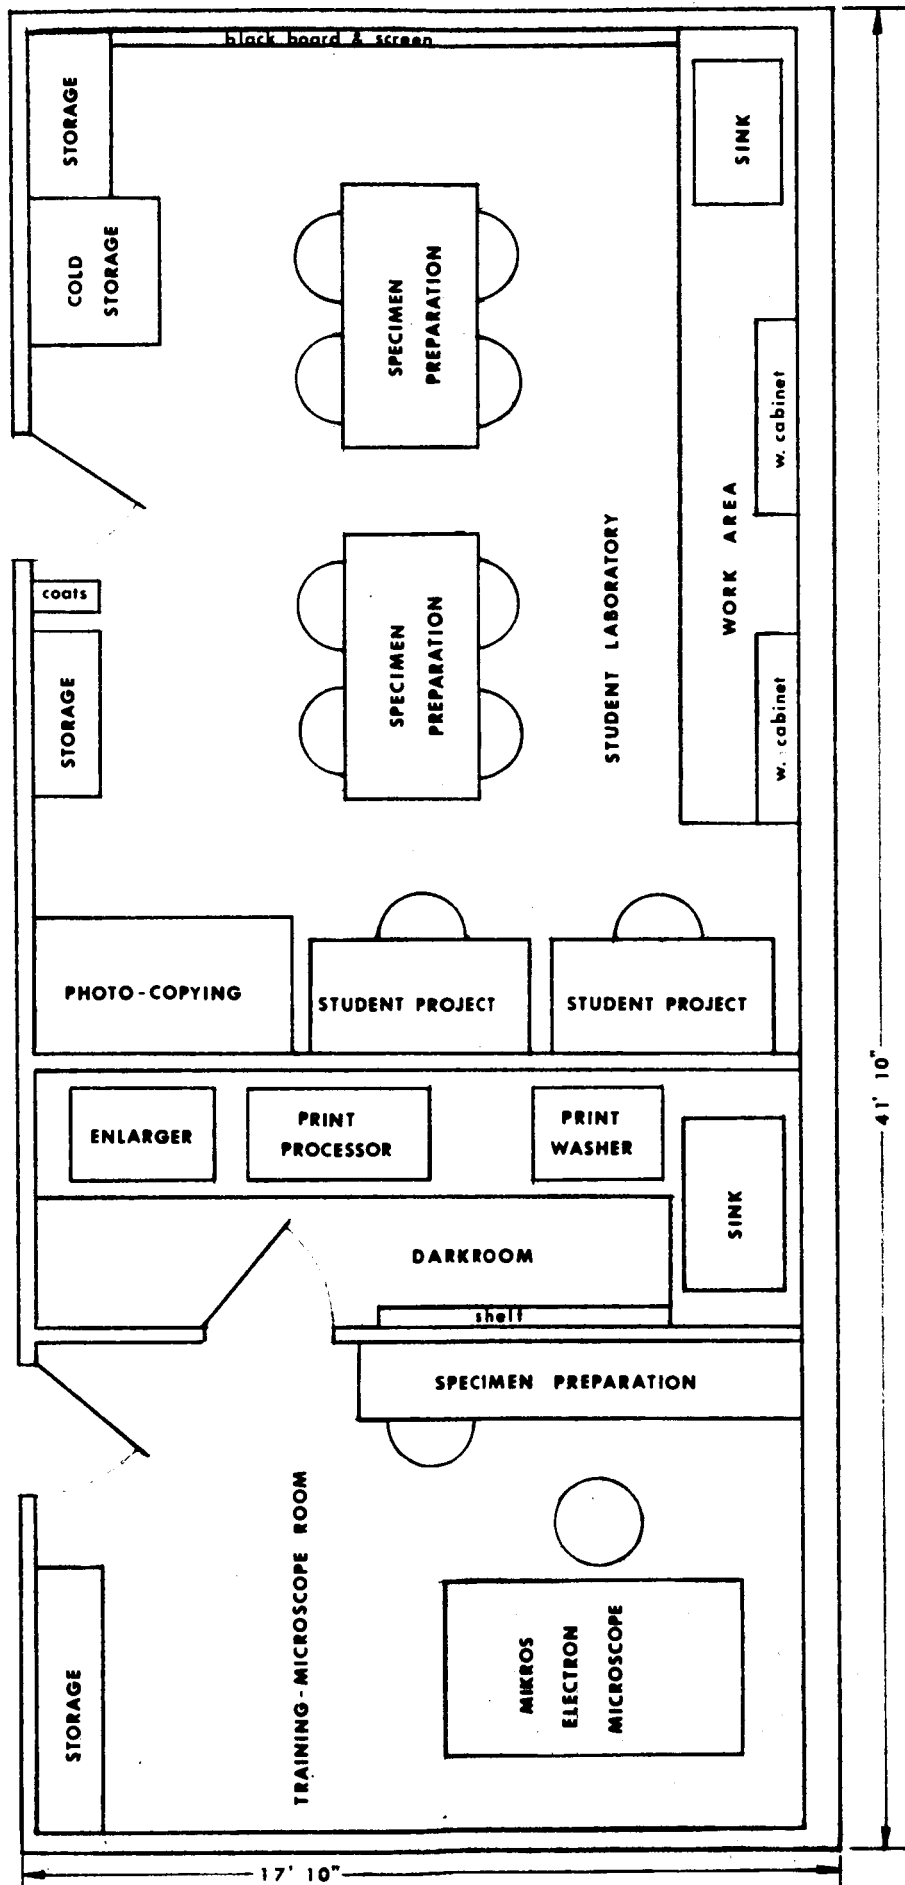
Proposed Layout of the New Electron Microscopy Training Facility.
